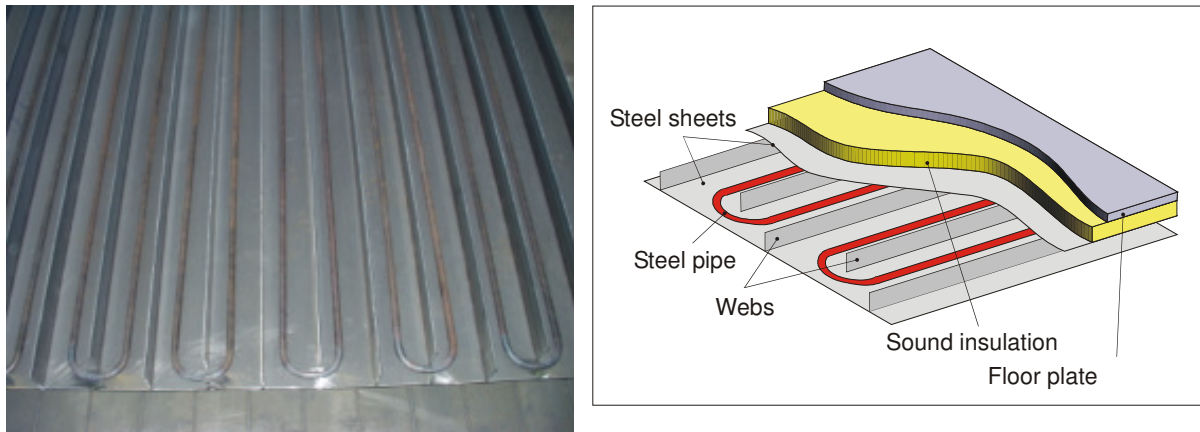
Integration of steel pipes in the steel deck system (left: steel pipes in the module before welding the upper steel sheet, right: principle of the completed deck system)
